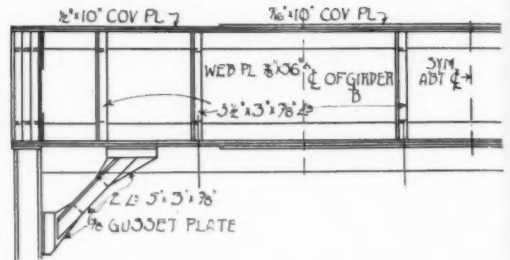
Detail of girder A at top of lantern and showing location of intersecting girder B.
